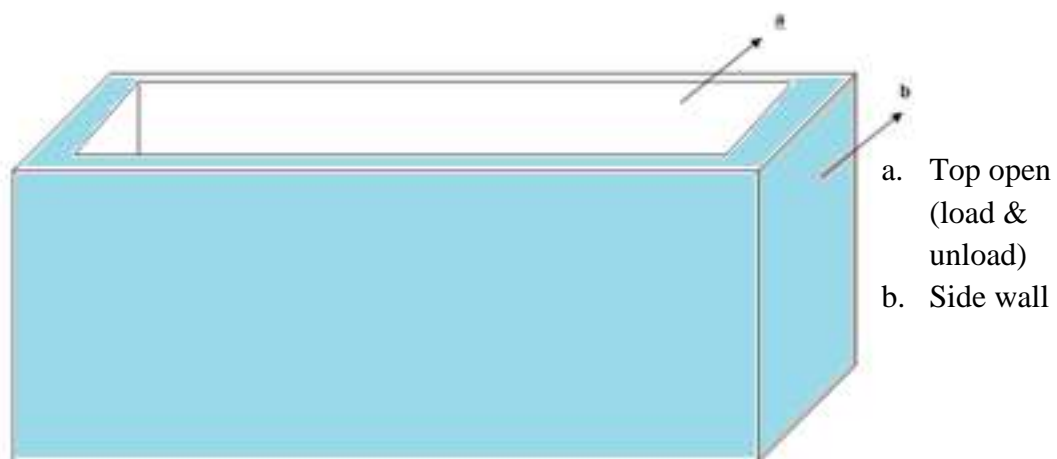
Schematic diagram of Panatha of Cement and Brick made open top like structure.
